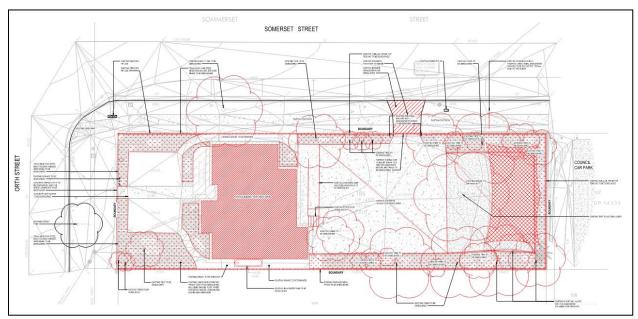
Demolition Plan (Source: Bell Architecture, 2023)
